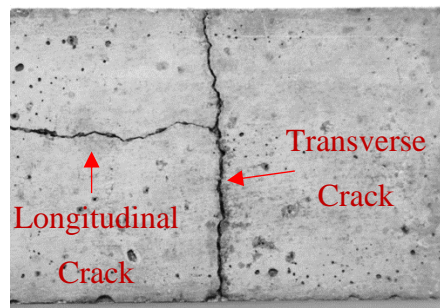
Cracking pattern from one single rebar of 6 mm.
